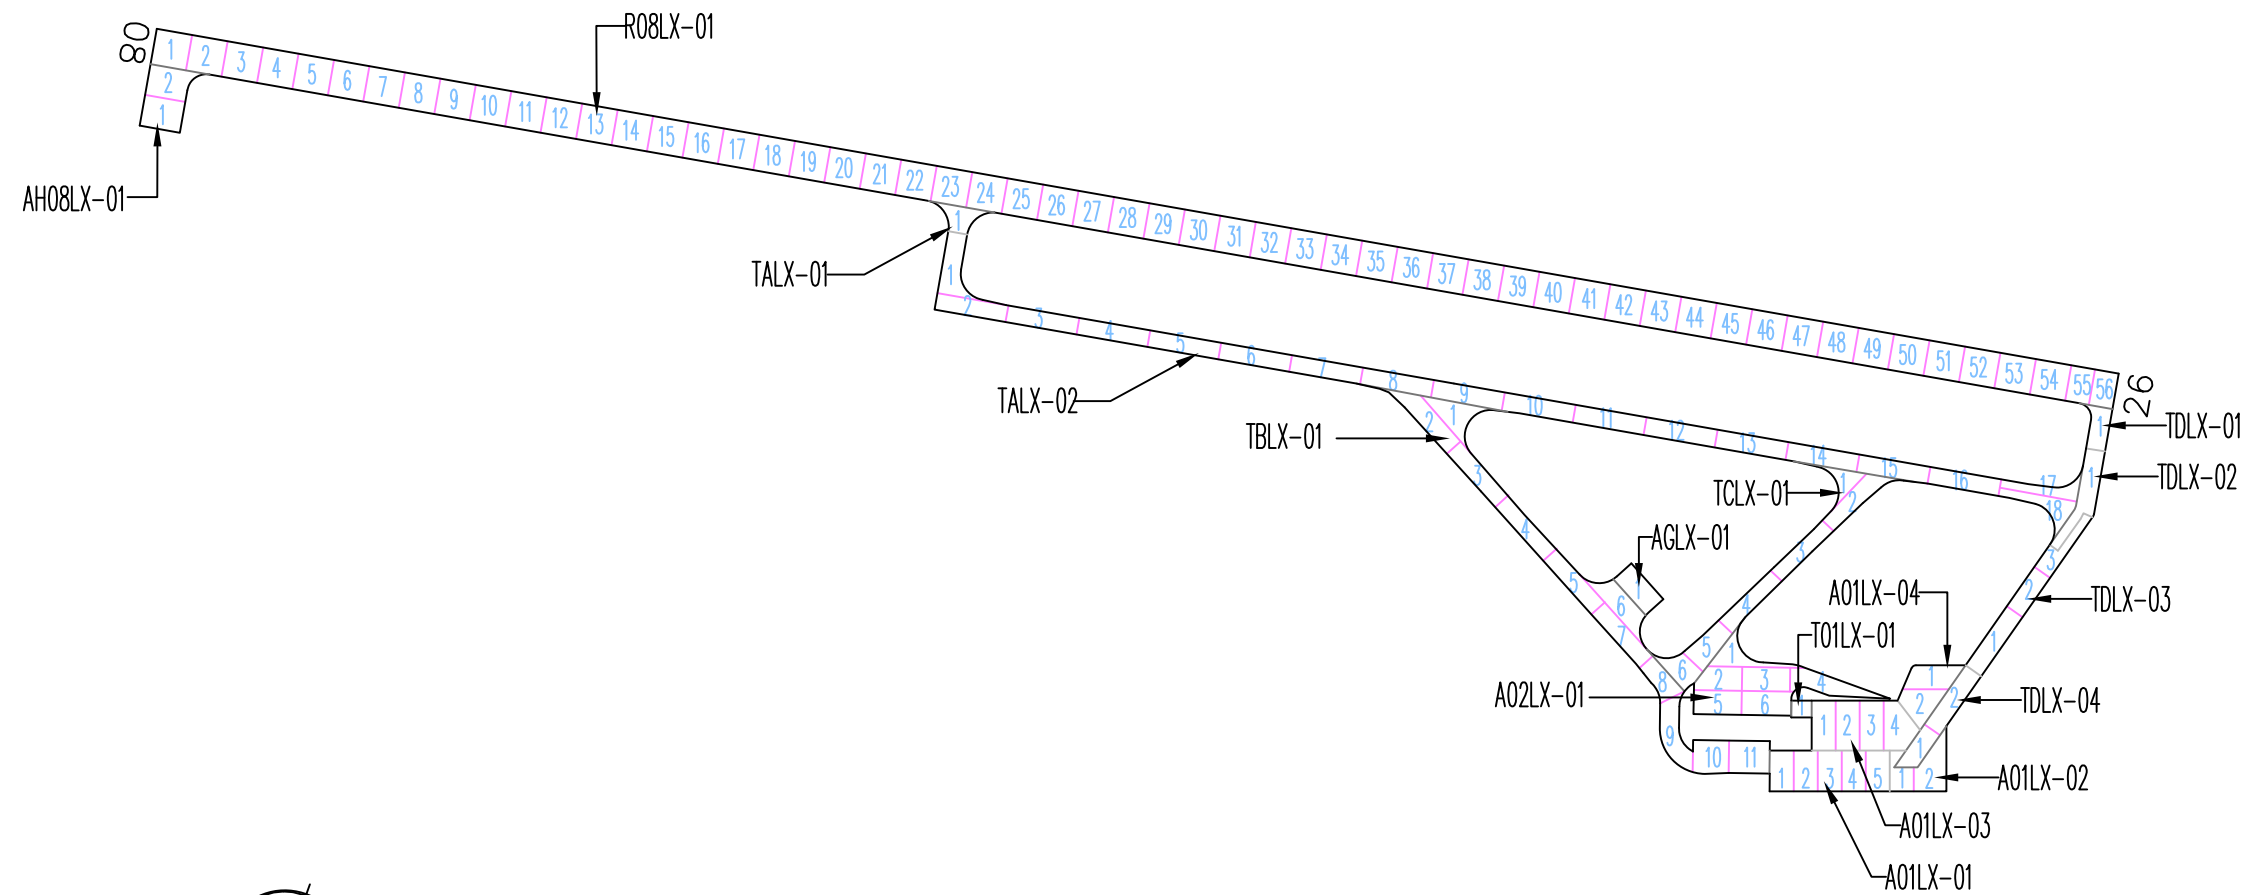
Pavement Branch, Section and Sample Unit Layout.
